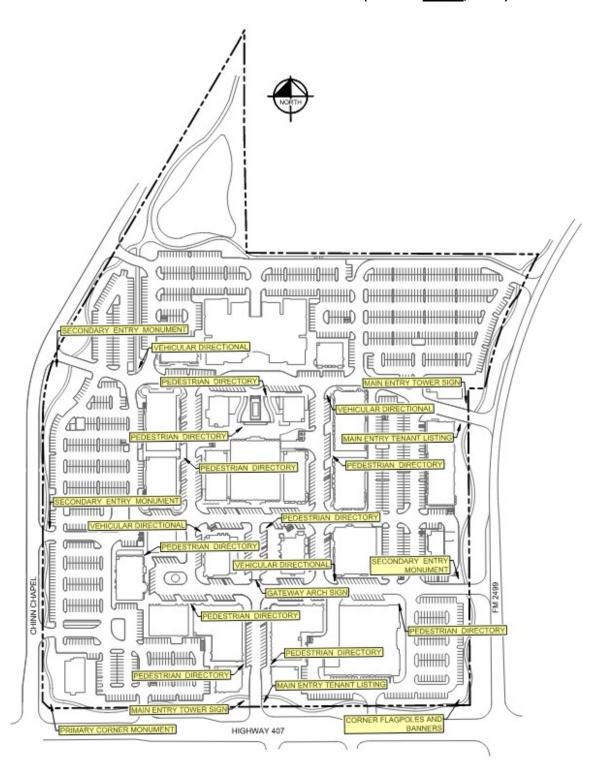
" to Exhibit "H": Location Plan (added \_\_\_\_\_, 2023)
